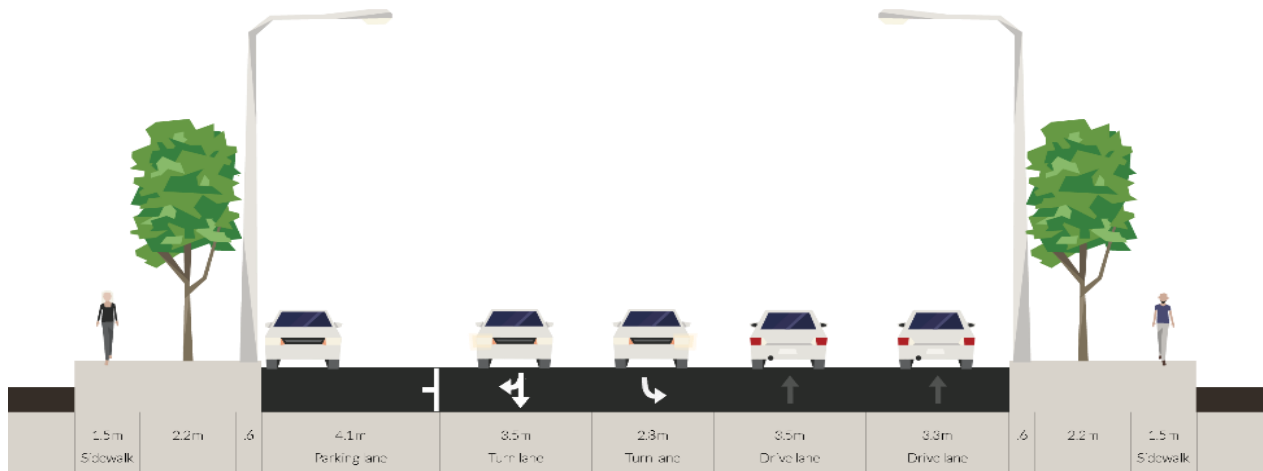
Existing Cross-section of Beecroft Rd at Sheppard Ave. W (Looking North)
